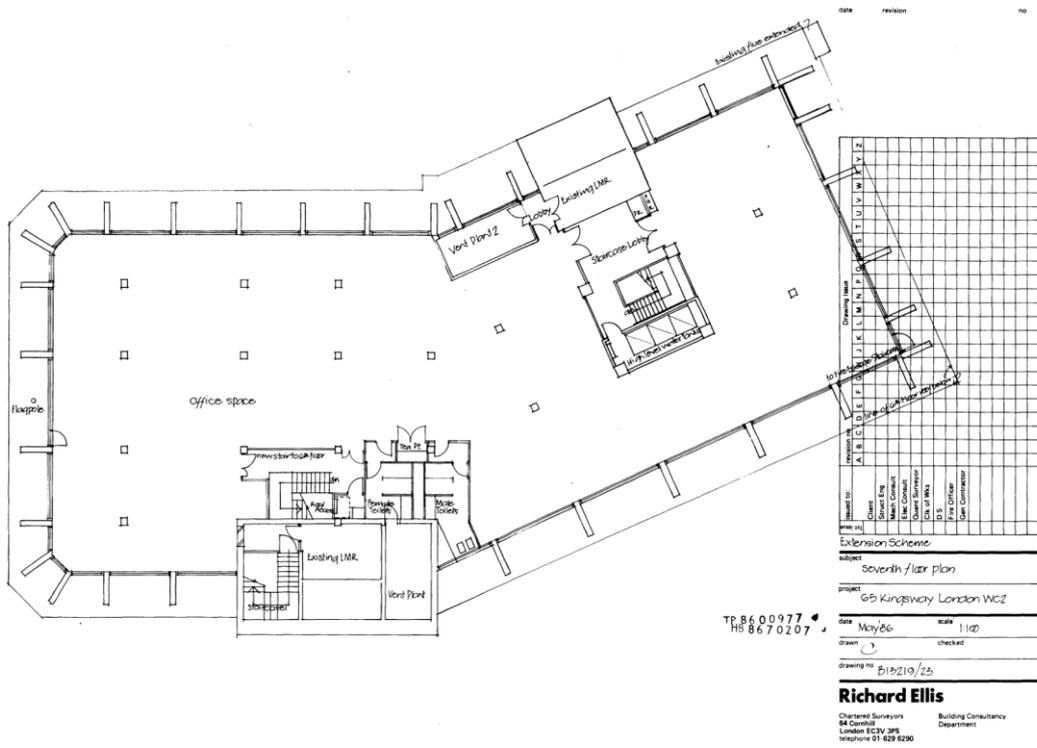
Extract from application 8670207 showing the proposed 7th floor plan
